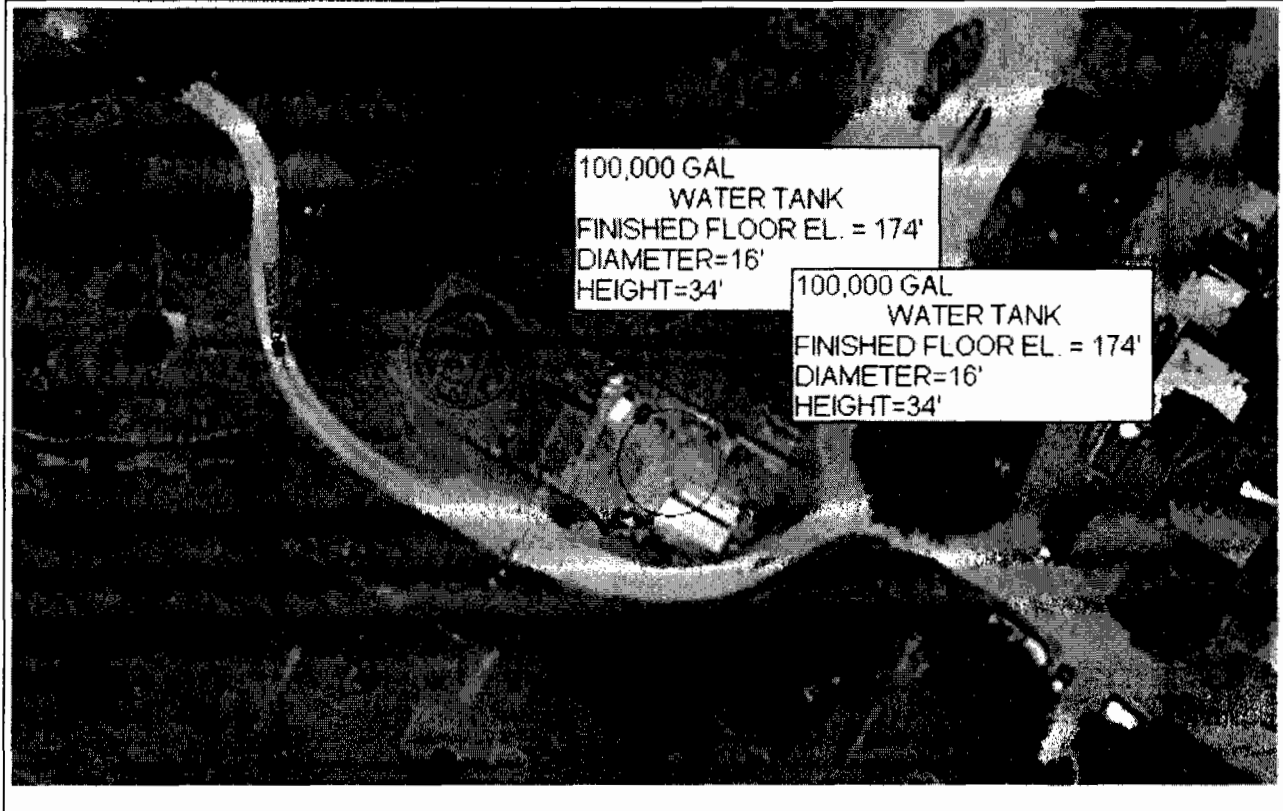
Proposed Schoolhouse Tank Site Plan
